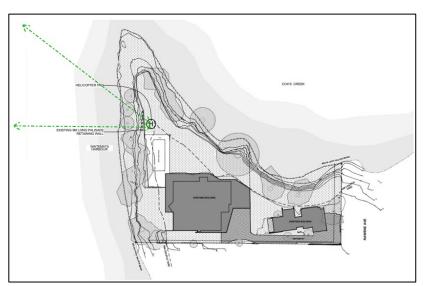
Helipad location plan with flight sector (Source: Application: Helipad Location Plan, dated 13-06-2024)
